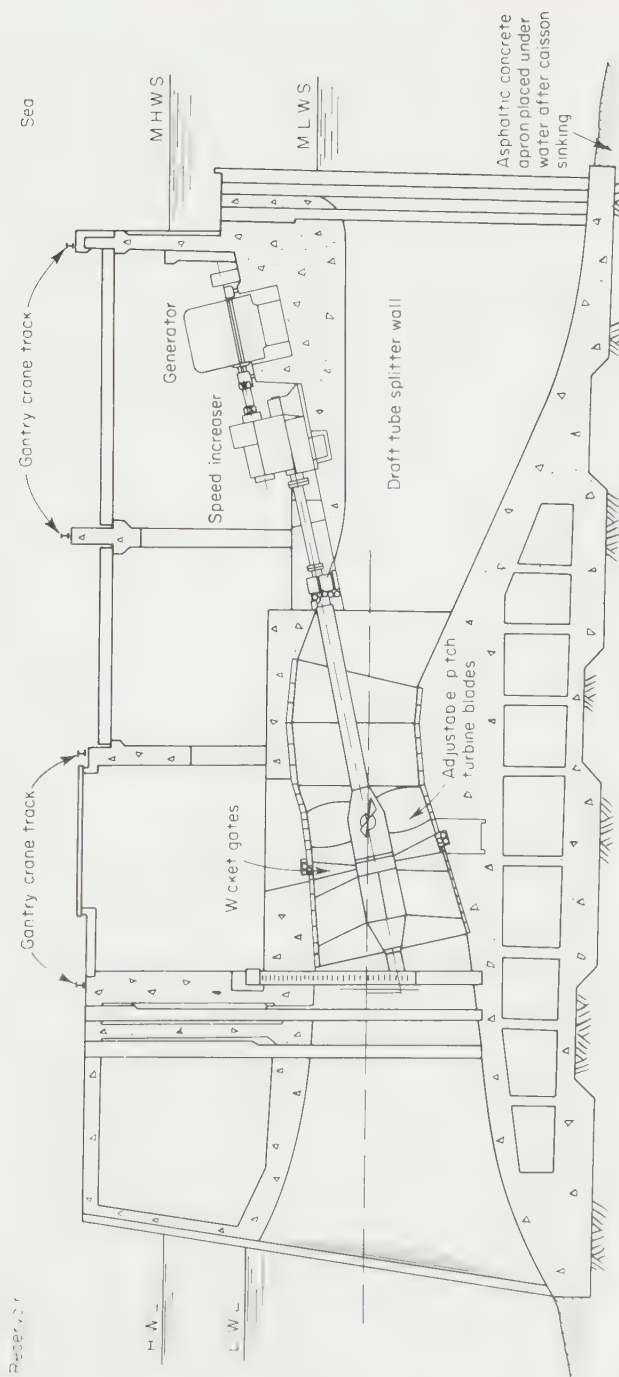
Longitudinal section through proposed caisson unit with TUBE turbine; cf. Fig. 19 of Chap. 26.
